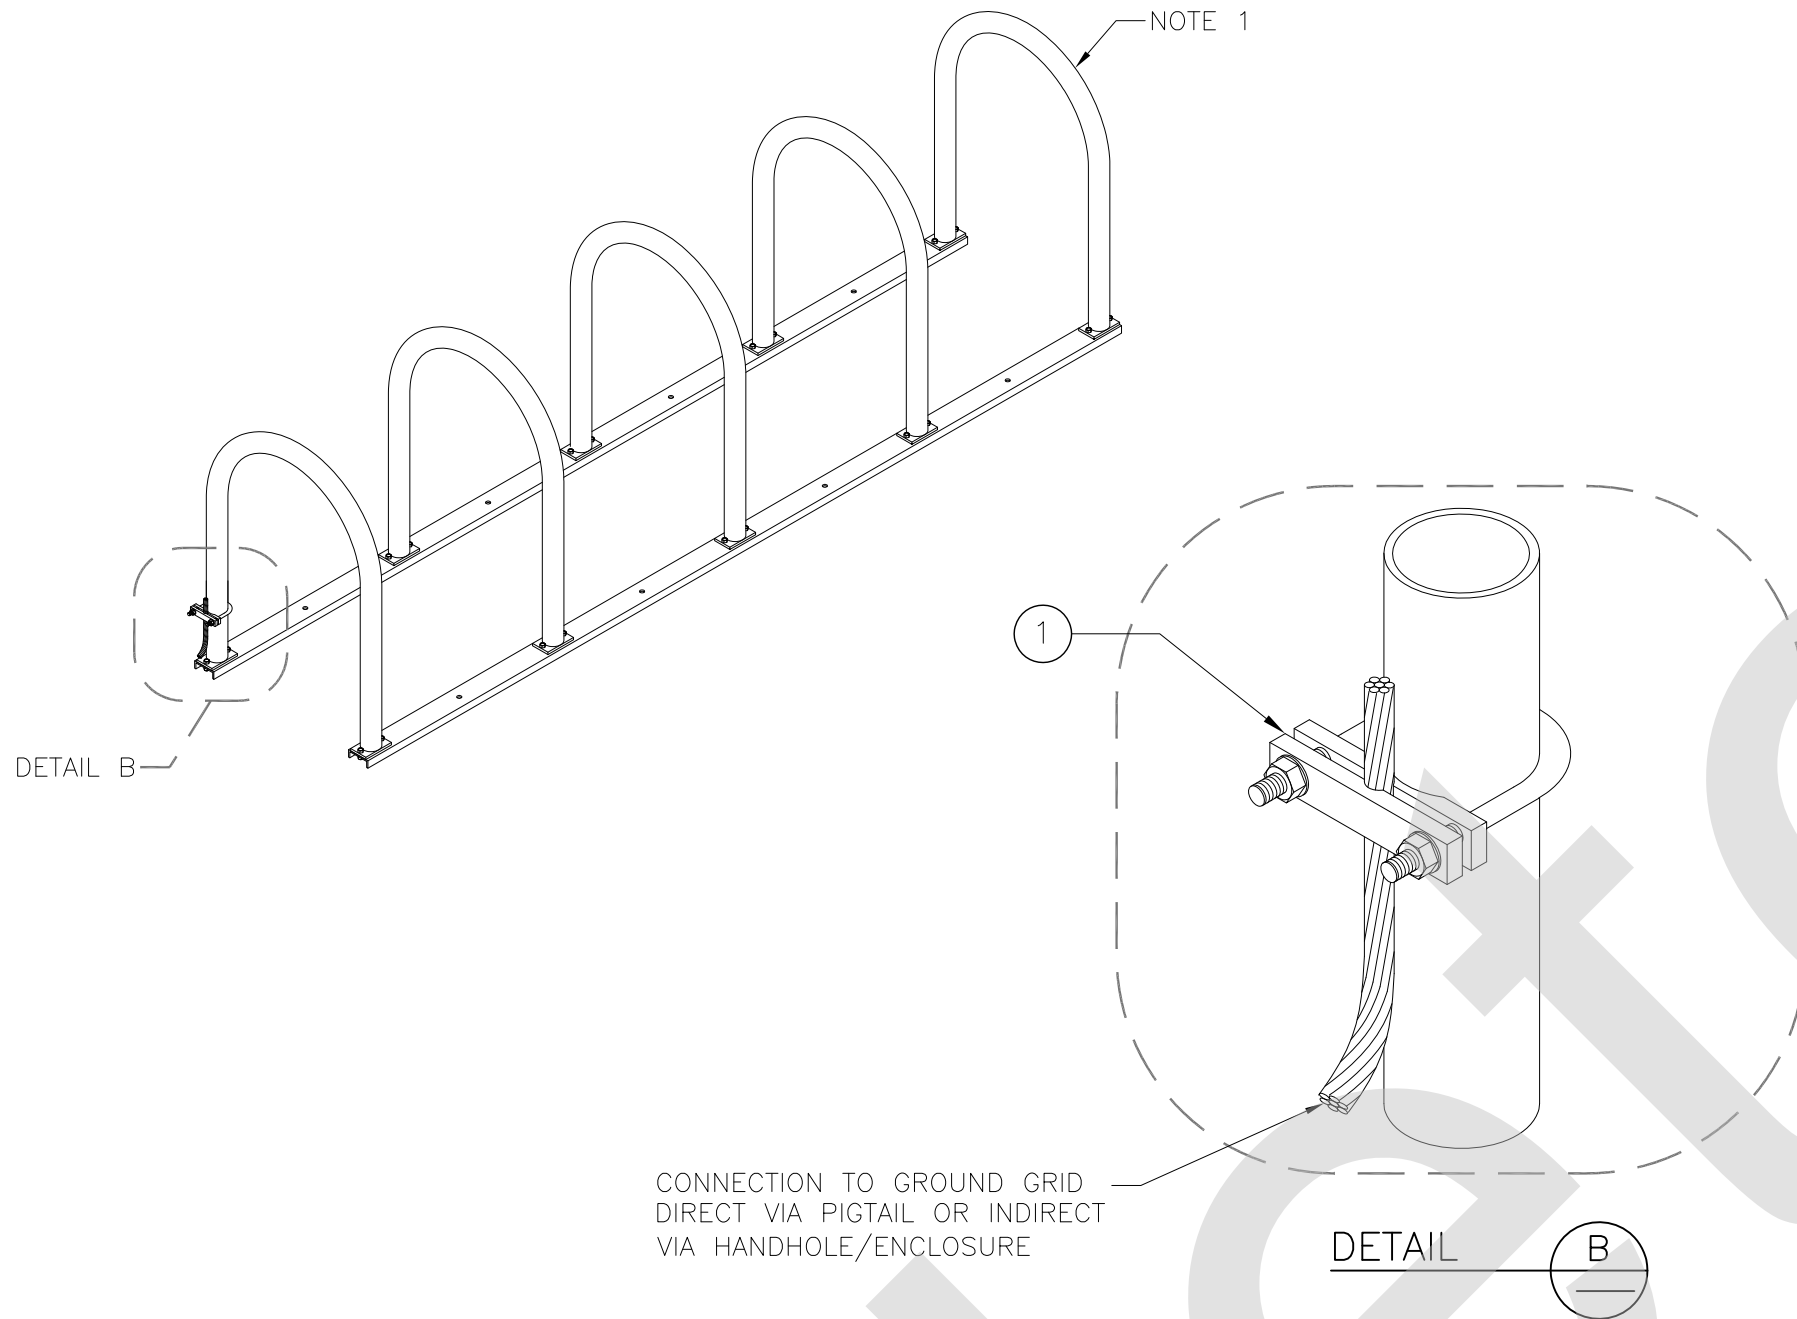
GROUNDING CONNECTION TO REMOVABLE METALLIC HANDRAILS
